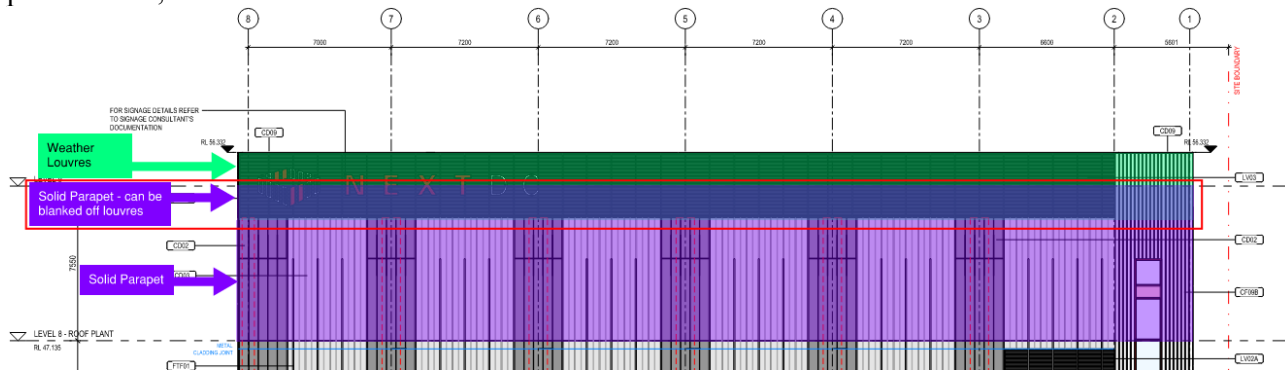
Rooftop acoustic barrier / screen north elevation (Solid up to +8 m From Level 8 FFL). New solid parapet section highlighted in red
